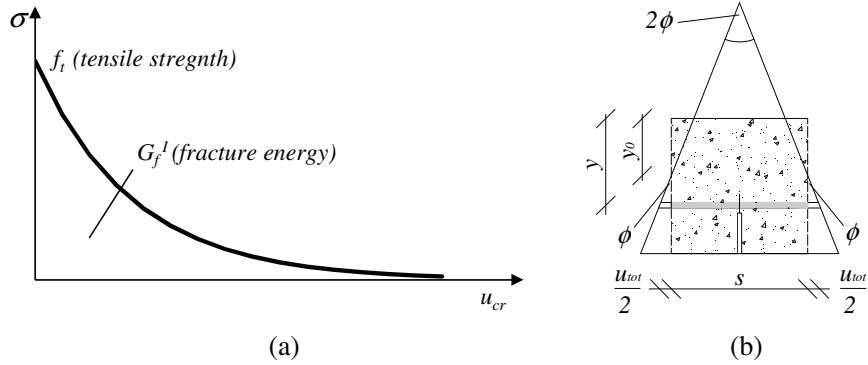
Cracked hinge: (a) stress-crack opening displacement of plain concrete and (b) main geometrical assumption under deformation.
